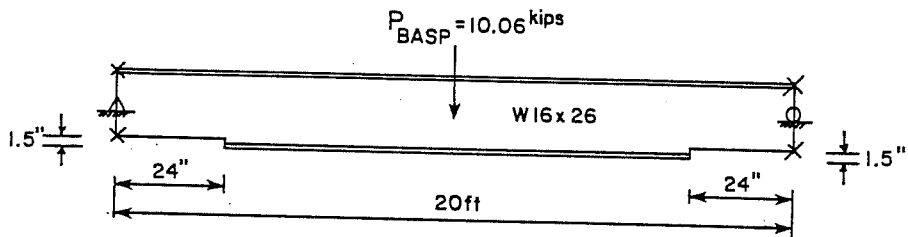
Buckled Shape of 24in. Bottom Flange Coped Beam
